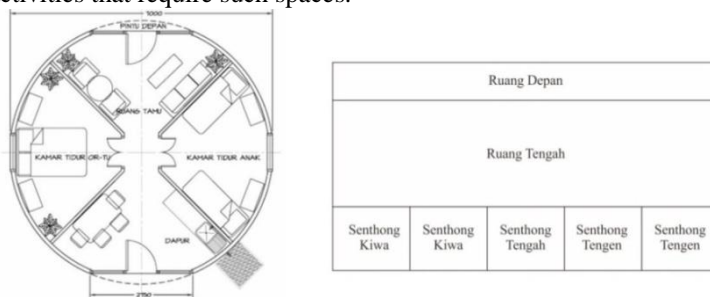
Comparison of Dome Houses plan and Local Houses Plan
